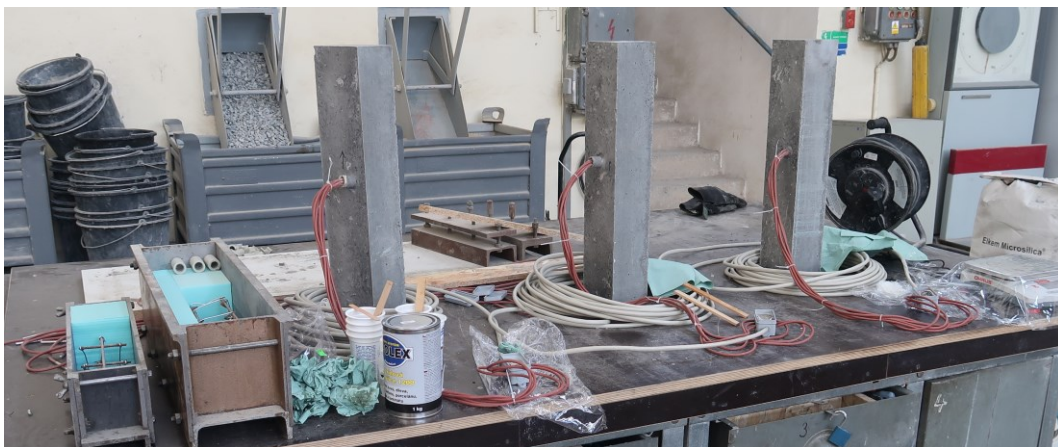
Beams ready for installation into structure (picture: J. Zatloukal)
